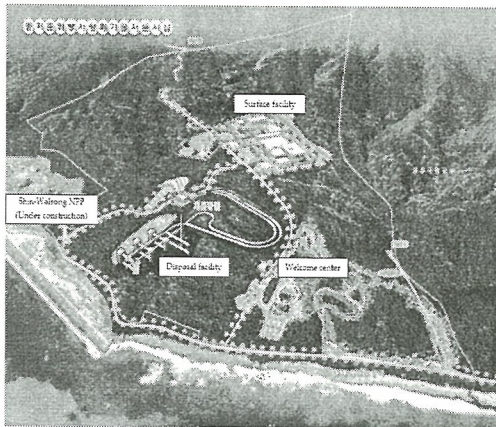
Layout of the Wolsong LILW Disposal Center.
